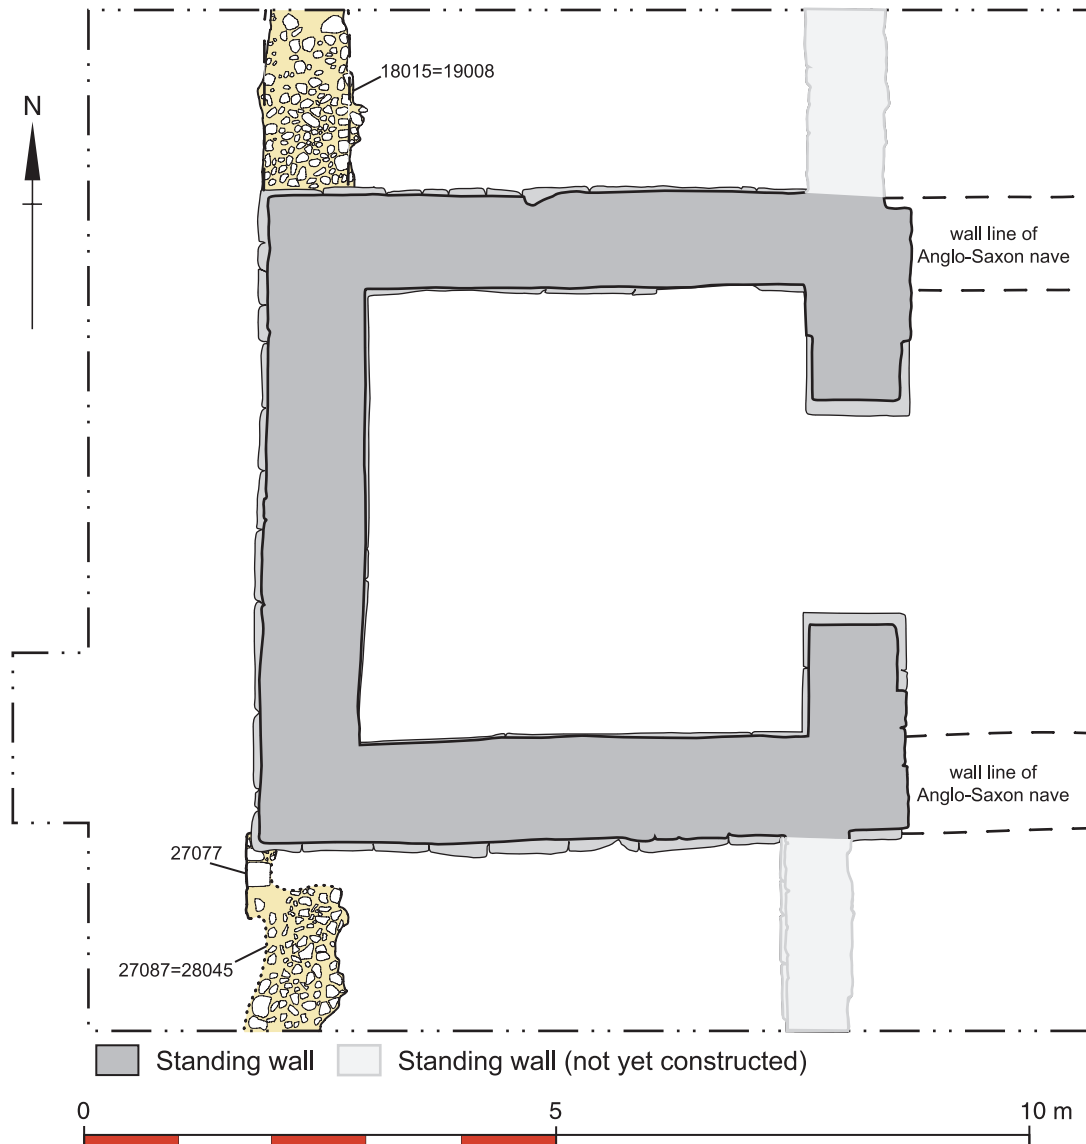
Construction of western walls of north and south aisles (Trench 2). Scale 1:80
